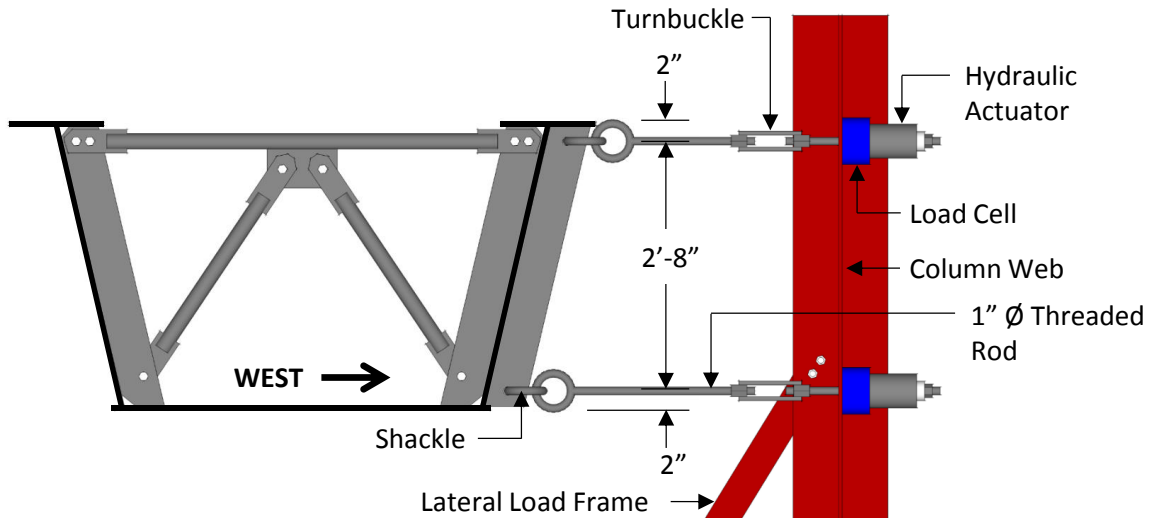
Tub Girder Lateral Load System – Cross-Section View
